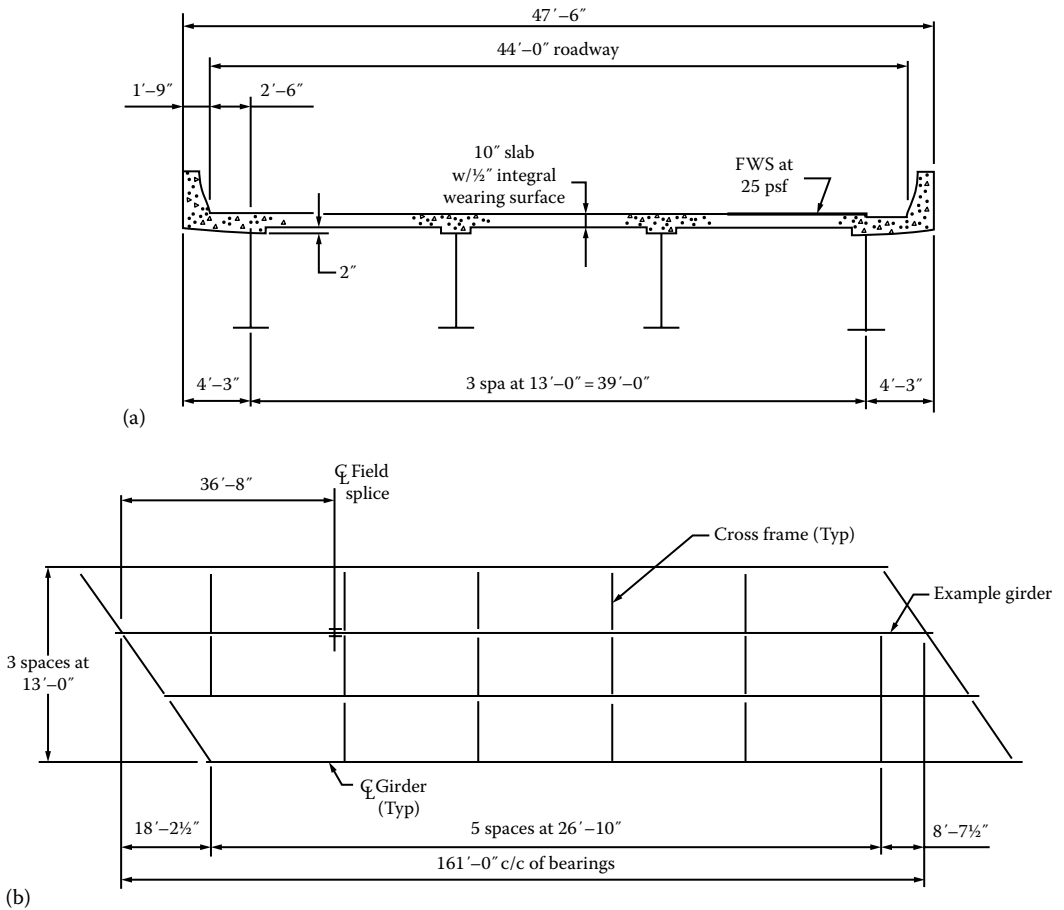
(a) Bridge cross section and (b) framing plan for Example 3.18. (Courtesy of American Iron and Steel Institute, New York.)
